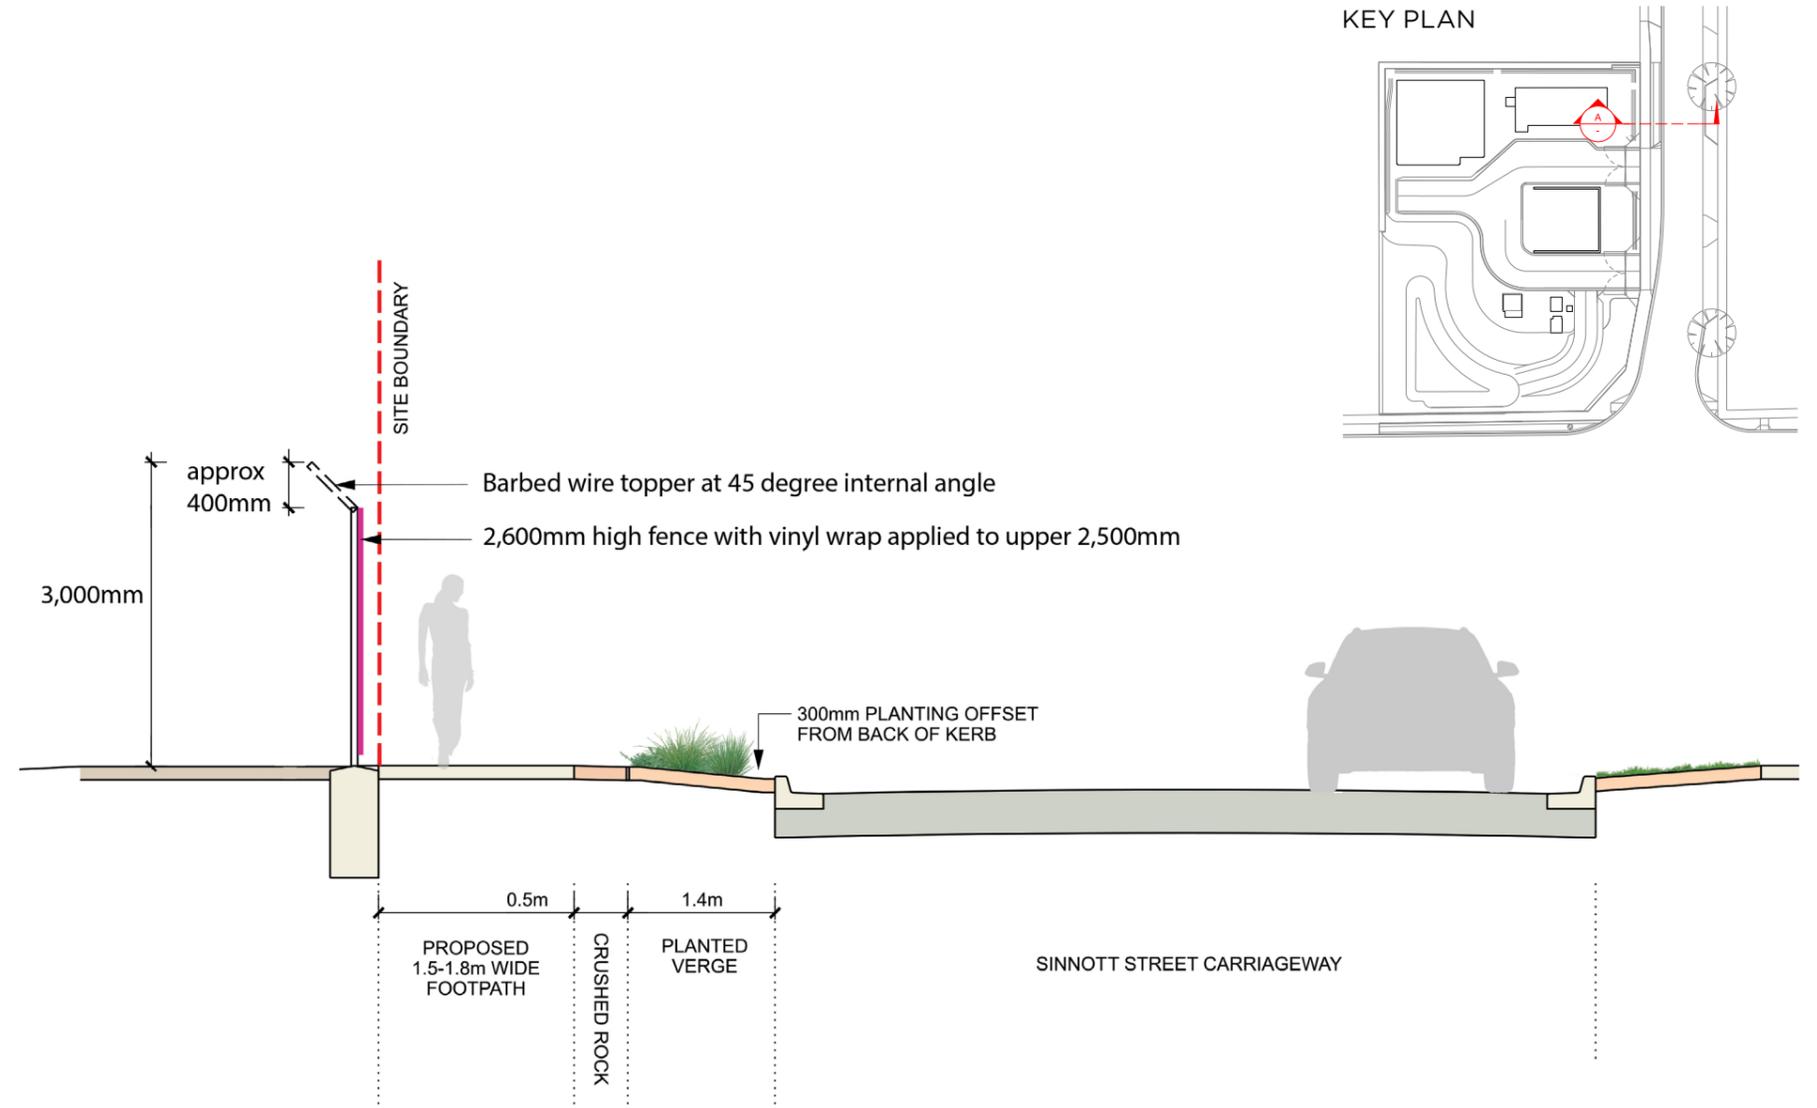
Section A - Indicative cross section showing the height of the steel fence and width of landscaped zone
